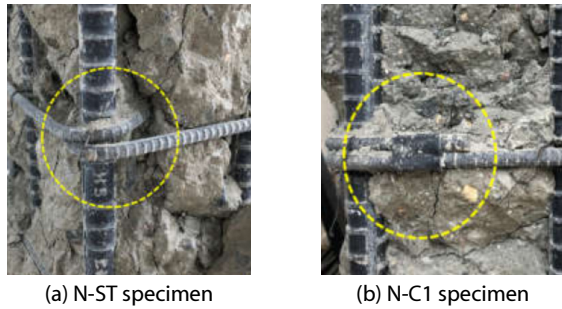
Hoop reinforcement details of normal strength concrete specimens at final stage
